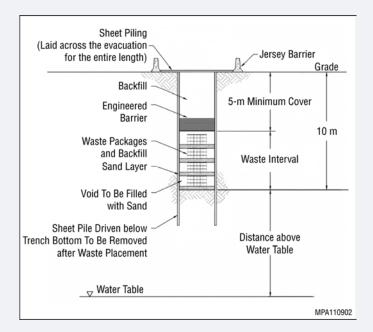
Cross Section of the Conceptual Design for a Trench
